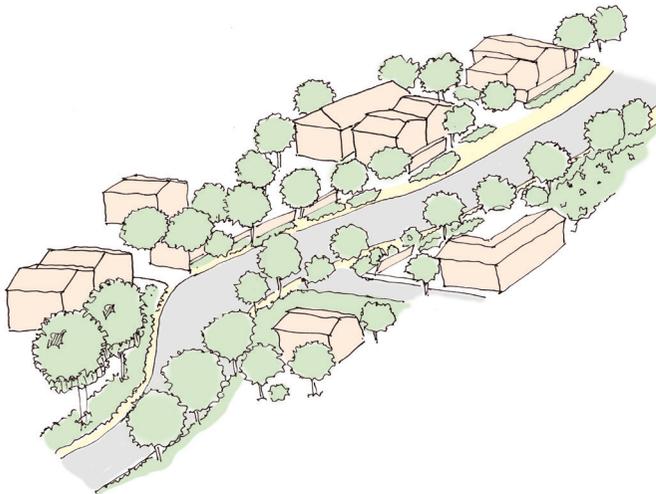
An example showing the frontages and layout of buildings in Limes Road within Kemble.
